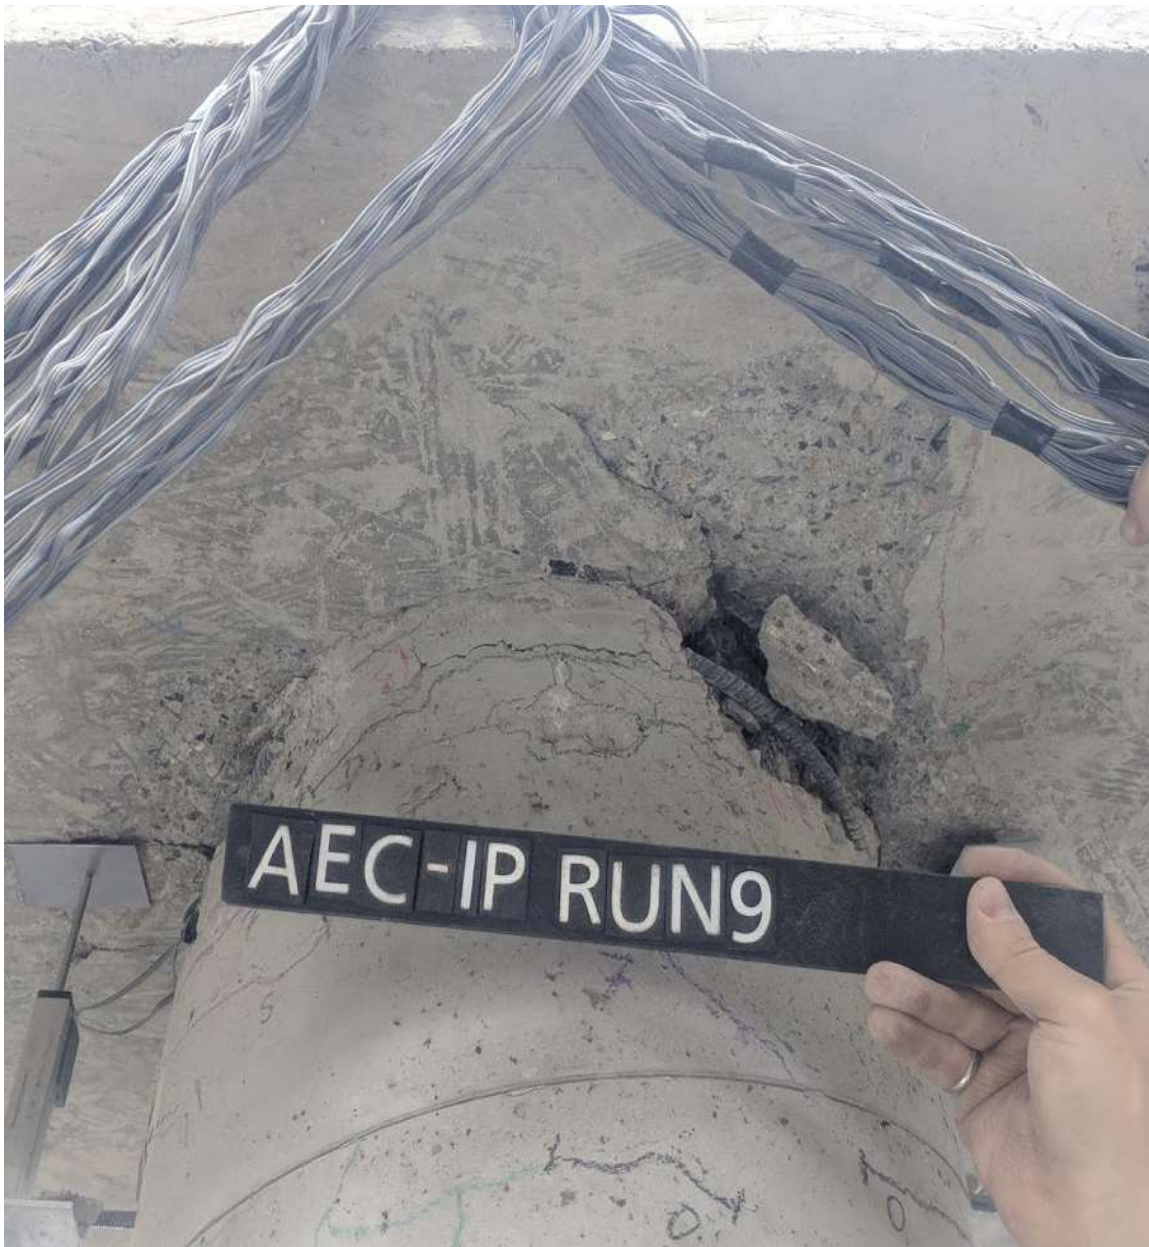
Run 9 – Column west face after final run (CIP – W face)
